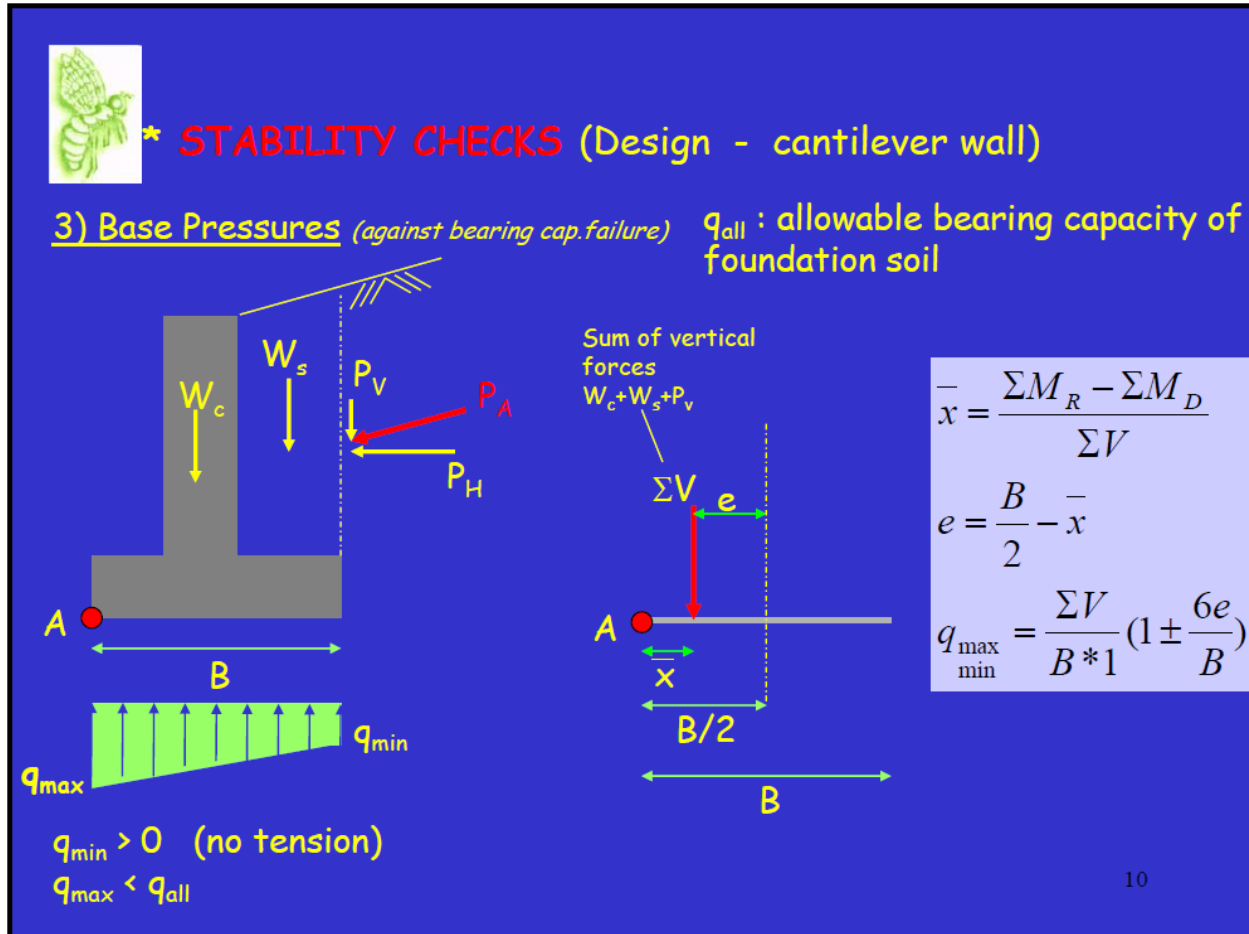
Bearing Cap Failure of a Cantilever Retaining Wall (from lecture notes)
